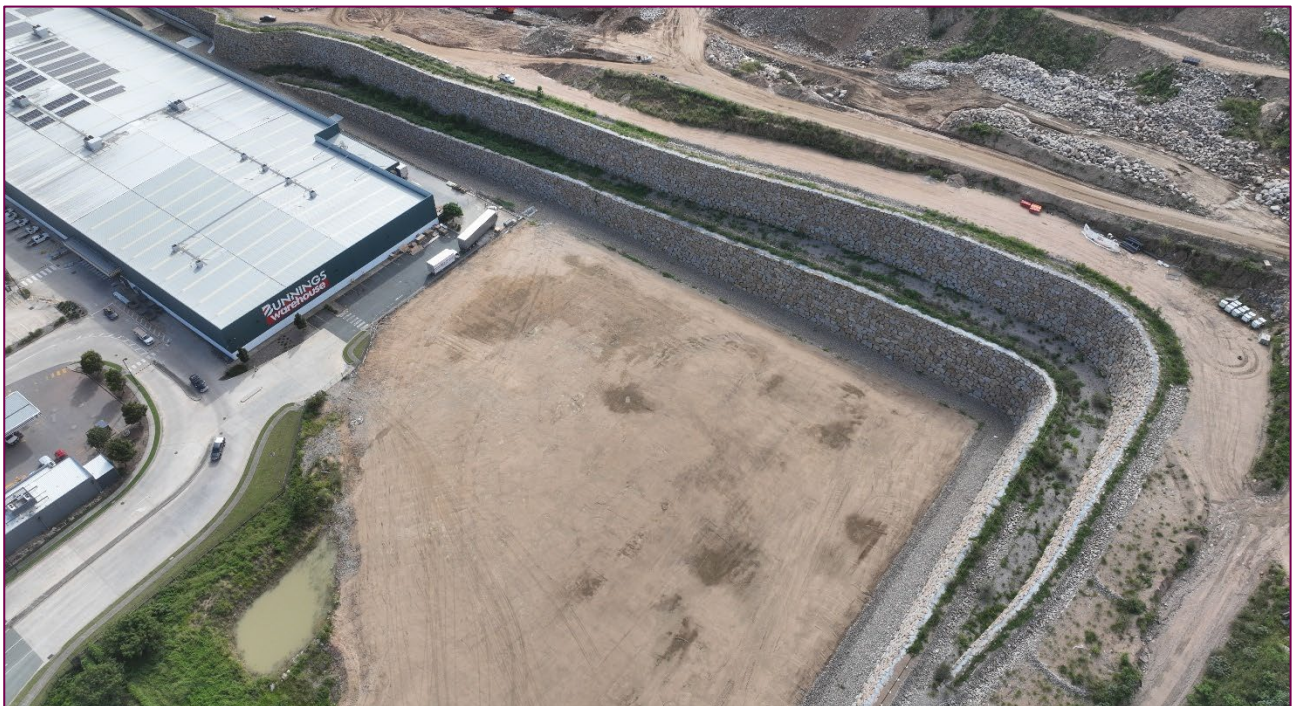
Completed Bunnings Wall (drone footage taken 18 March 2026)
